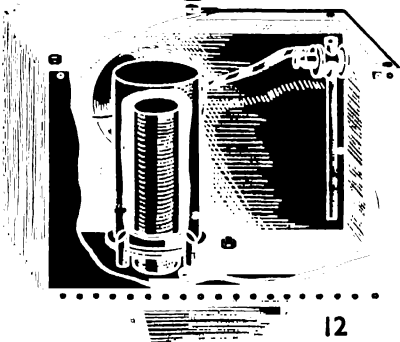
(above). "Certus" automatic flushing tank for drains, which will discharge with slowest feed (Burns Bros., Ltd.): tank and castings galvanized; outlets can be fitted with flange and spigot pipe straight or bent, or with flange for lead pipe. Fig. 11 (top right). Automatic flushing cistern, painted c.i. Fig. 12. Automatic flush tank, galvanized iron, regulating valve. Thos. Crapper & Co., Ltd.
